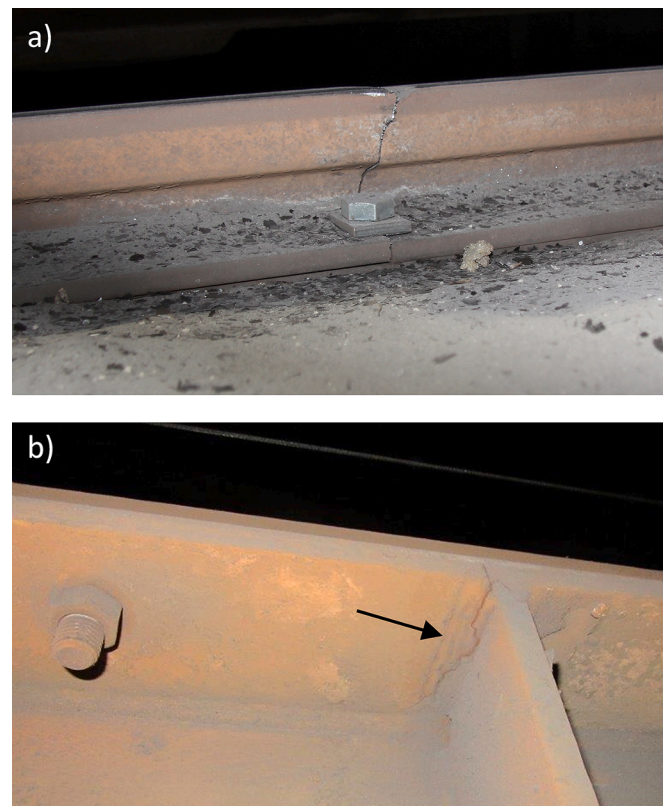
a) Through-thickness crack of crane rail, b) cracks in fillet welds of transverse stiffener at the connection to the top flange of the girder.
